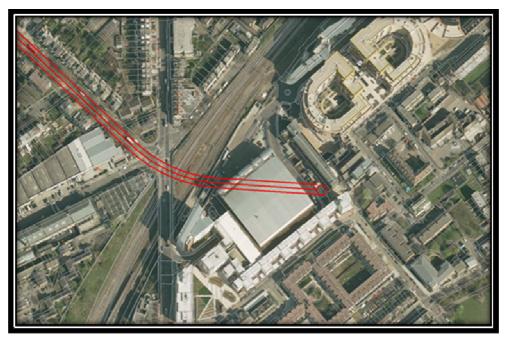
Hornsey St, Islington, showing the cable tunnel route and location of the NG Headhouse
